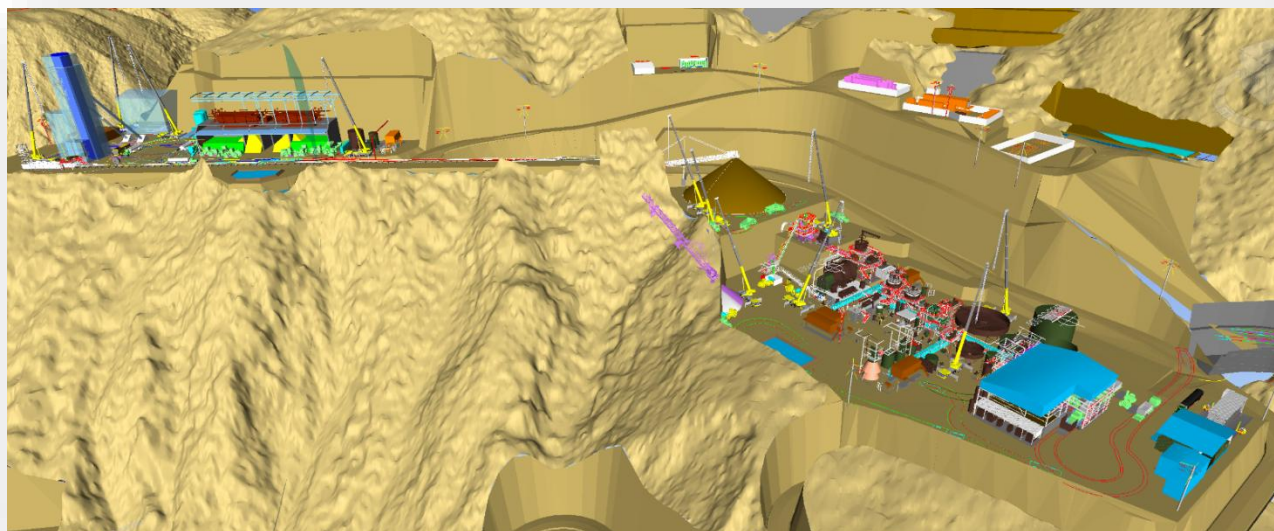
Process plant, paste backfill plant and shaft/winder system supporting underground ore delivery.
